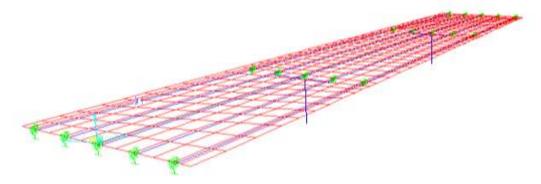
Modeling of the three span steel I-girder bridge with CSiBridge.
